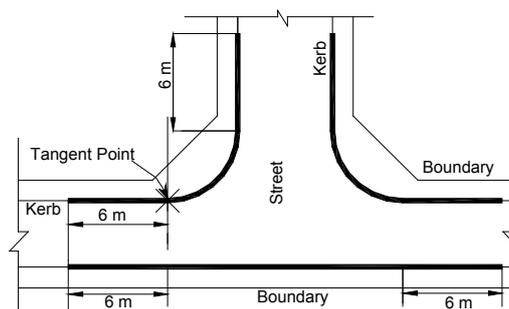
Restricted locations of driveways entry as shown heavy edged lines.
